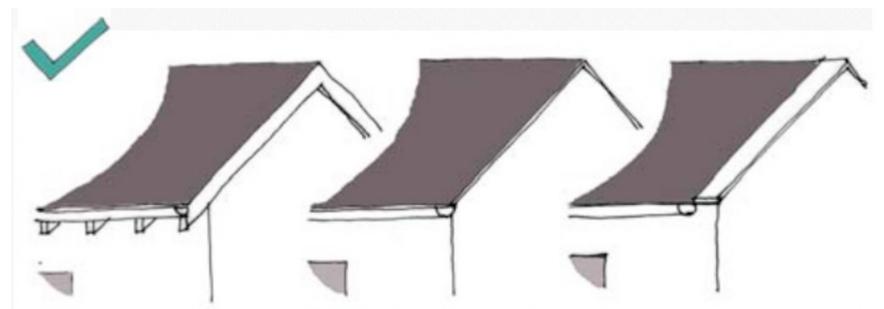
Mayo County Council guidelines on suitable roof to wall junction details [Mayo CoCo 2008]
